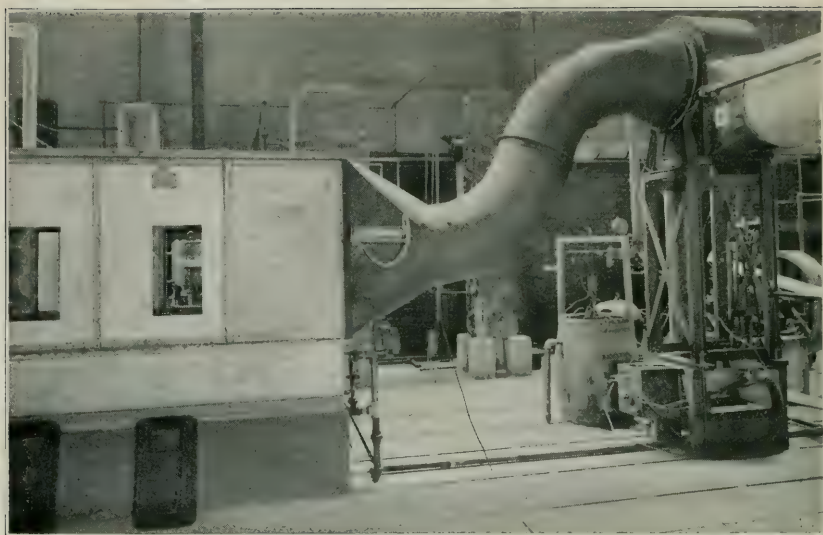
VIEW OF AIR WASHER AND FAN WITH COLUMNS IN BACKGROUND
